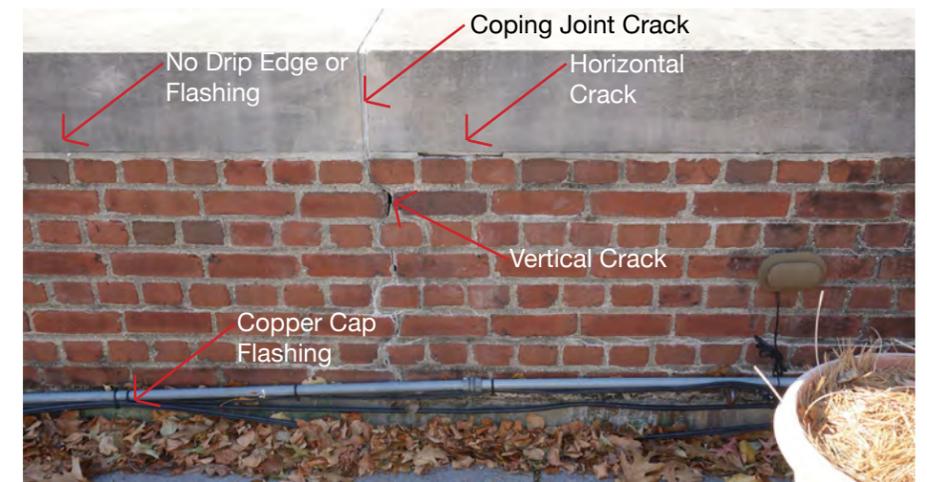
5 Parapet Wall - North - Horizontal & Vertical Cracks
